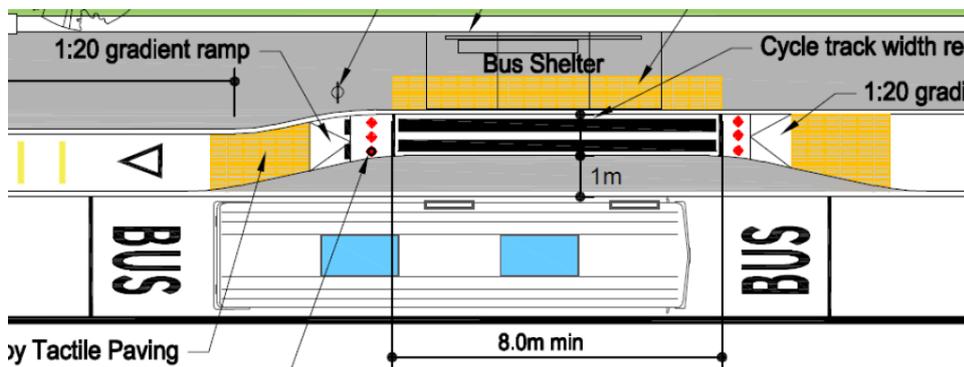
Alternative Shelter Location Back of Footway (Narrow Island with Adequate Footway Widths)
